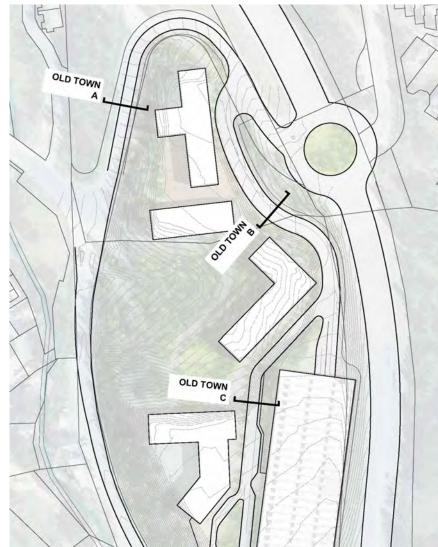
PRIMARY PRIVATE STREET ALTERNATIVES - TYPICAL STREET SECTIONS
